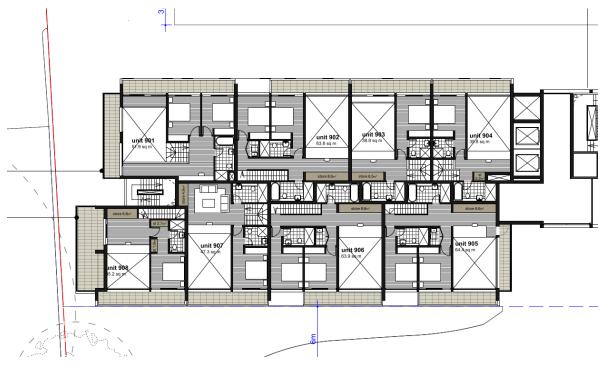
Approved Level Mezzanine (2 storey component of the residential apartments).
